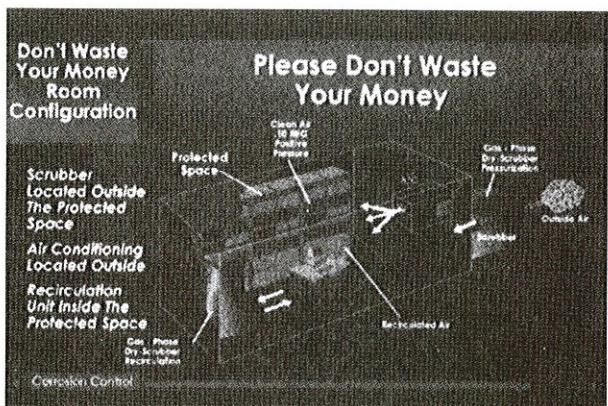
Control room layout, using pressurization and recirculation, with air-handling equipment located in an outside contaminated area.
